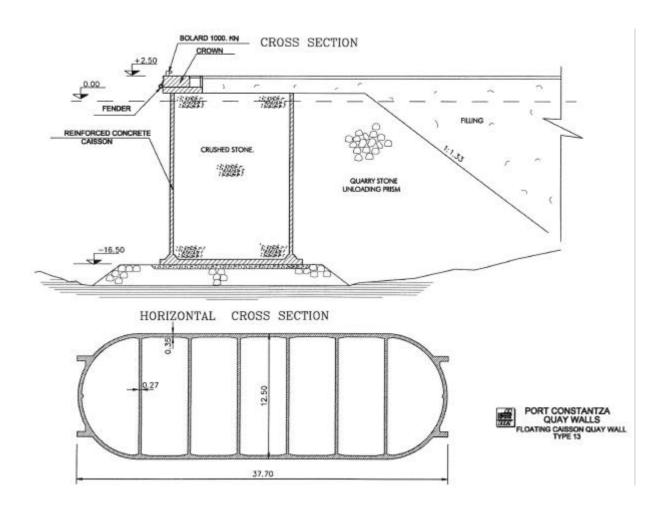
Typical Section of Existing Concrete Caisson Type 13
